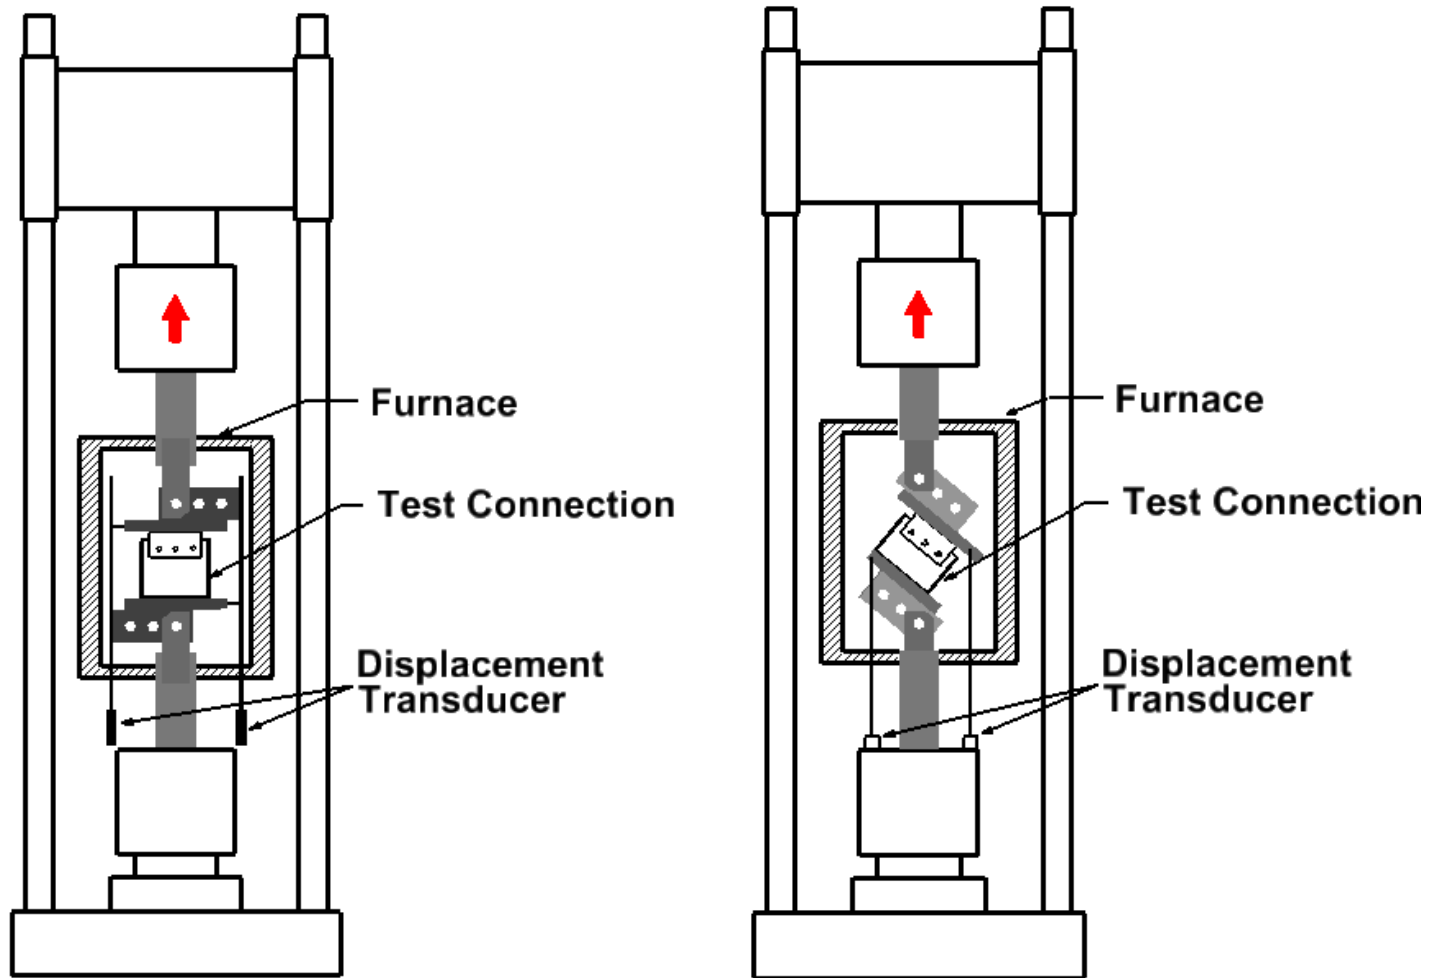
Layout of test setup for connections subject to tension (left) and specimens subject to inclined tension (right)
